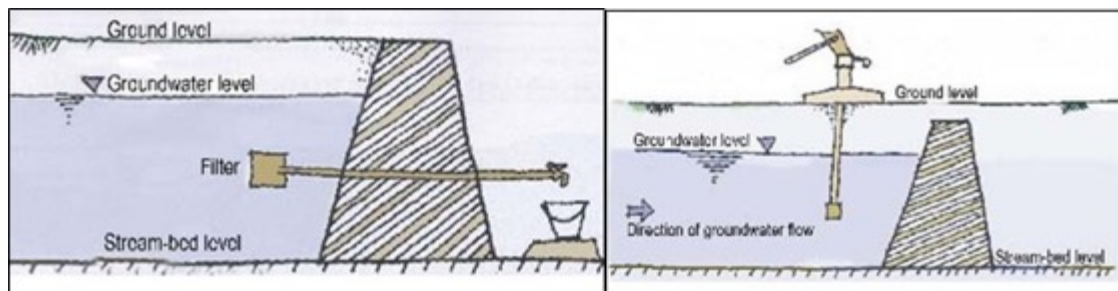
Left - Outlet pipe with tap. Right - Cross section of a subsurface dam with a hand pump for water extraction. [12]
